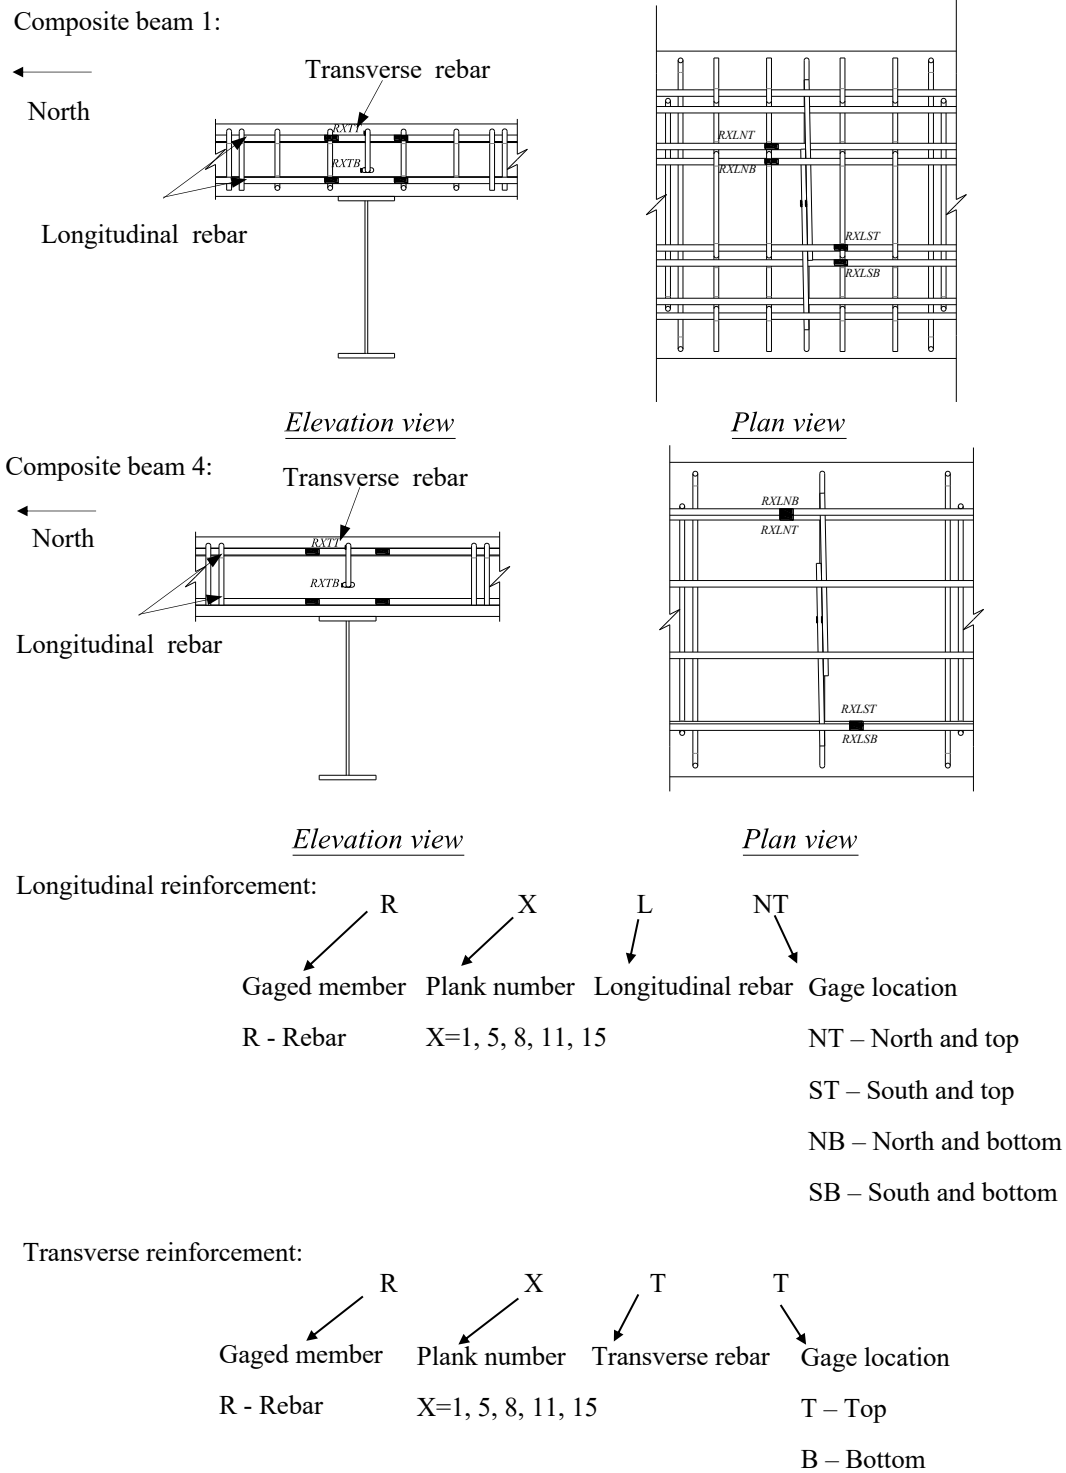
Longitudinal and transverse reinforcement gage layout
